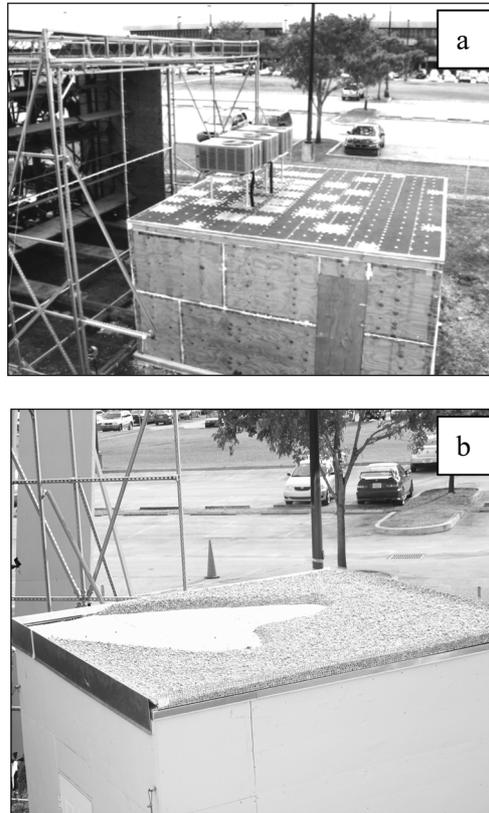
Testing with full-scale WoW: (a) Rooftop equipment testing, (b) Gravel scour with standard fascia
